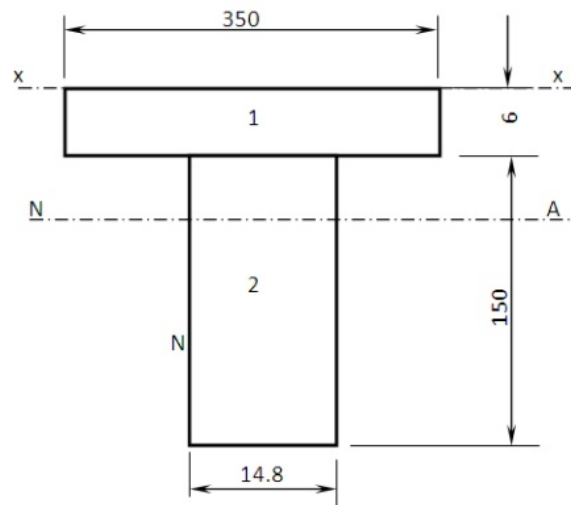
Geometry of one bar stiffener and attached plate. Four such units constitute RUC of plate stiffened with bar stiffener
